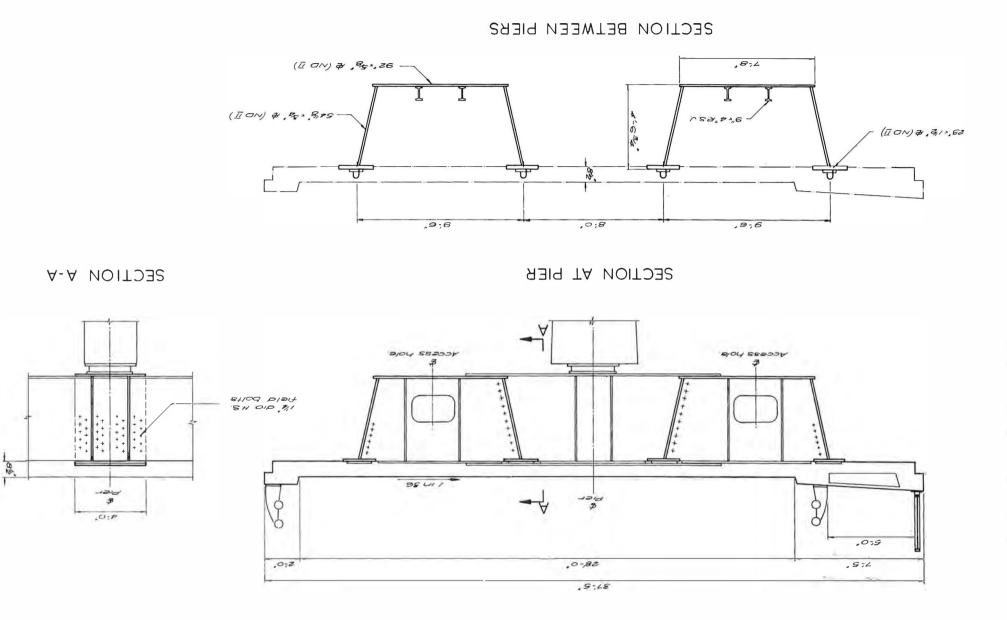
Kororoit Creek Road Bridge. Details of Construction.
